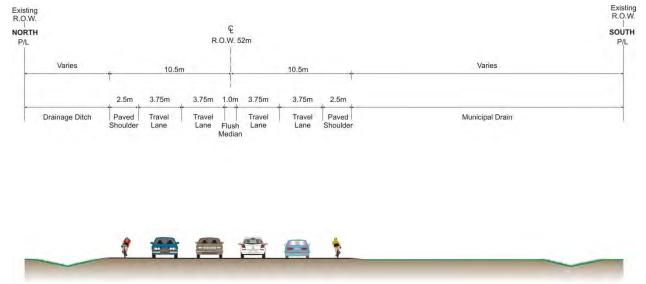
PIC 2 TYPICAL CROSS-SECTION COUNTY ROAD 42 PUCE RIVER BRIDGE TO COUNTY ROAD 25 (E. PUCE ROAD)
